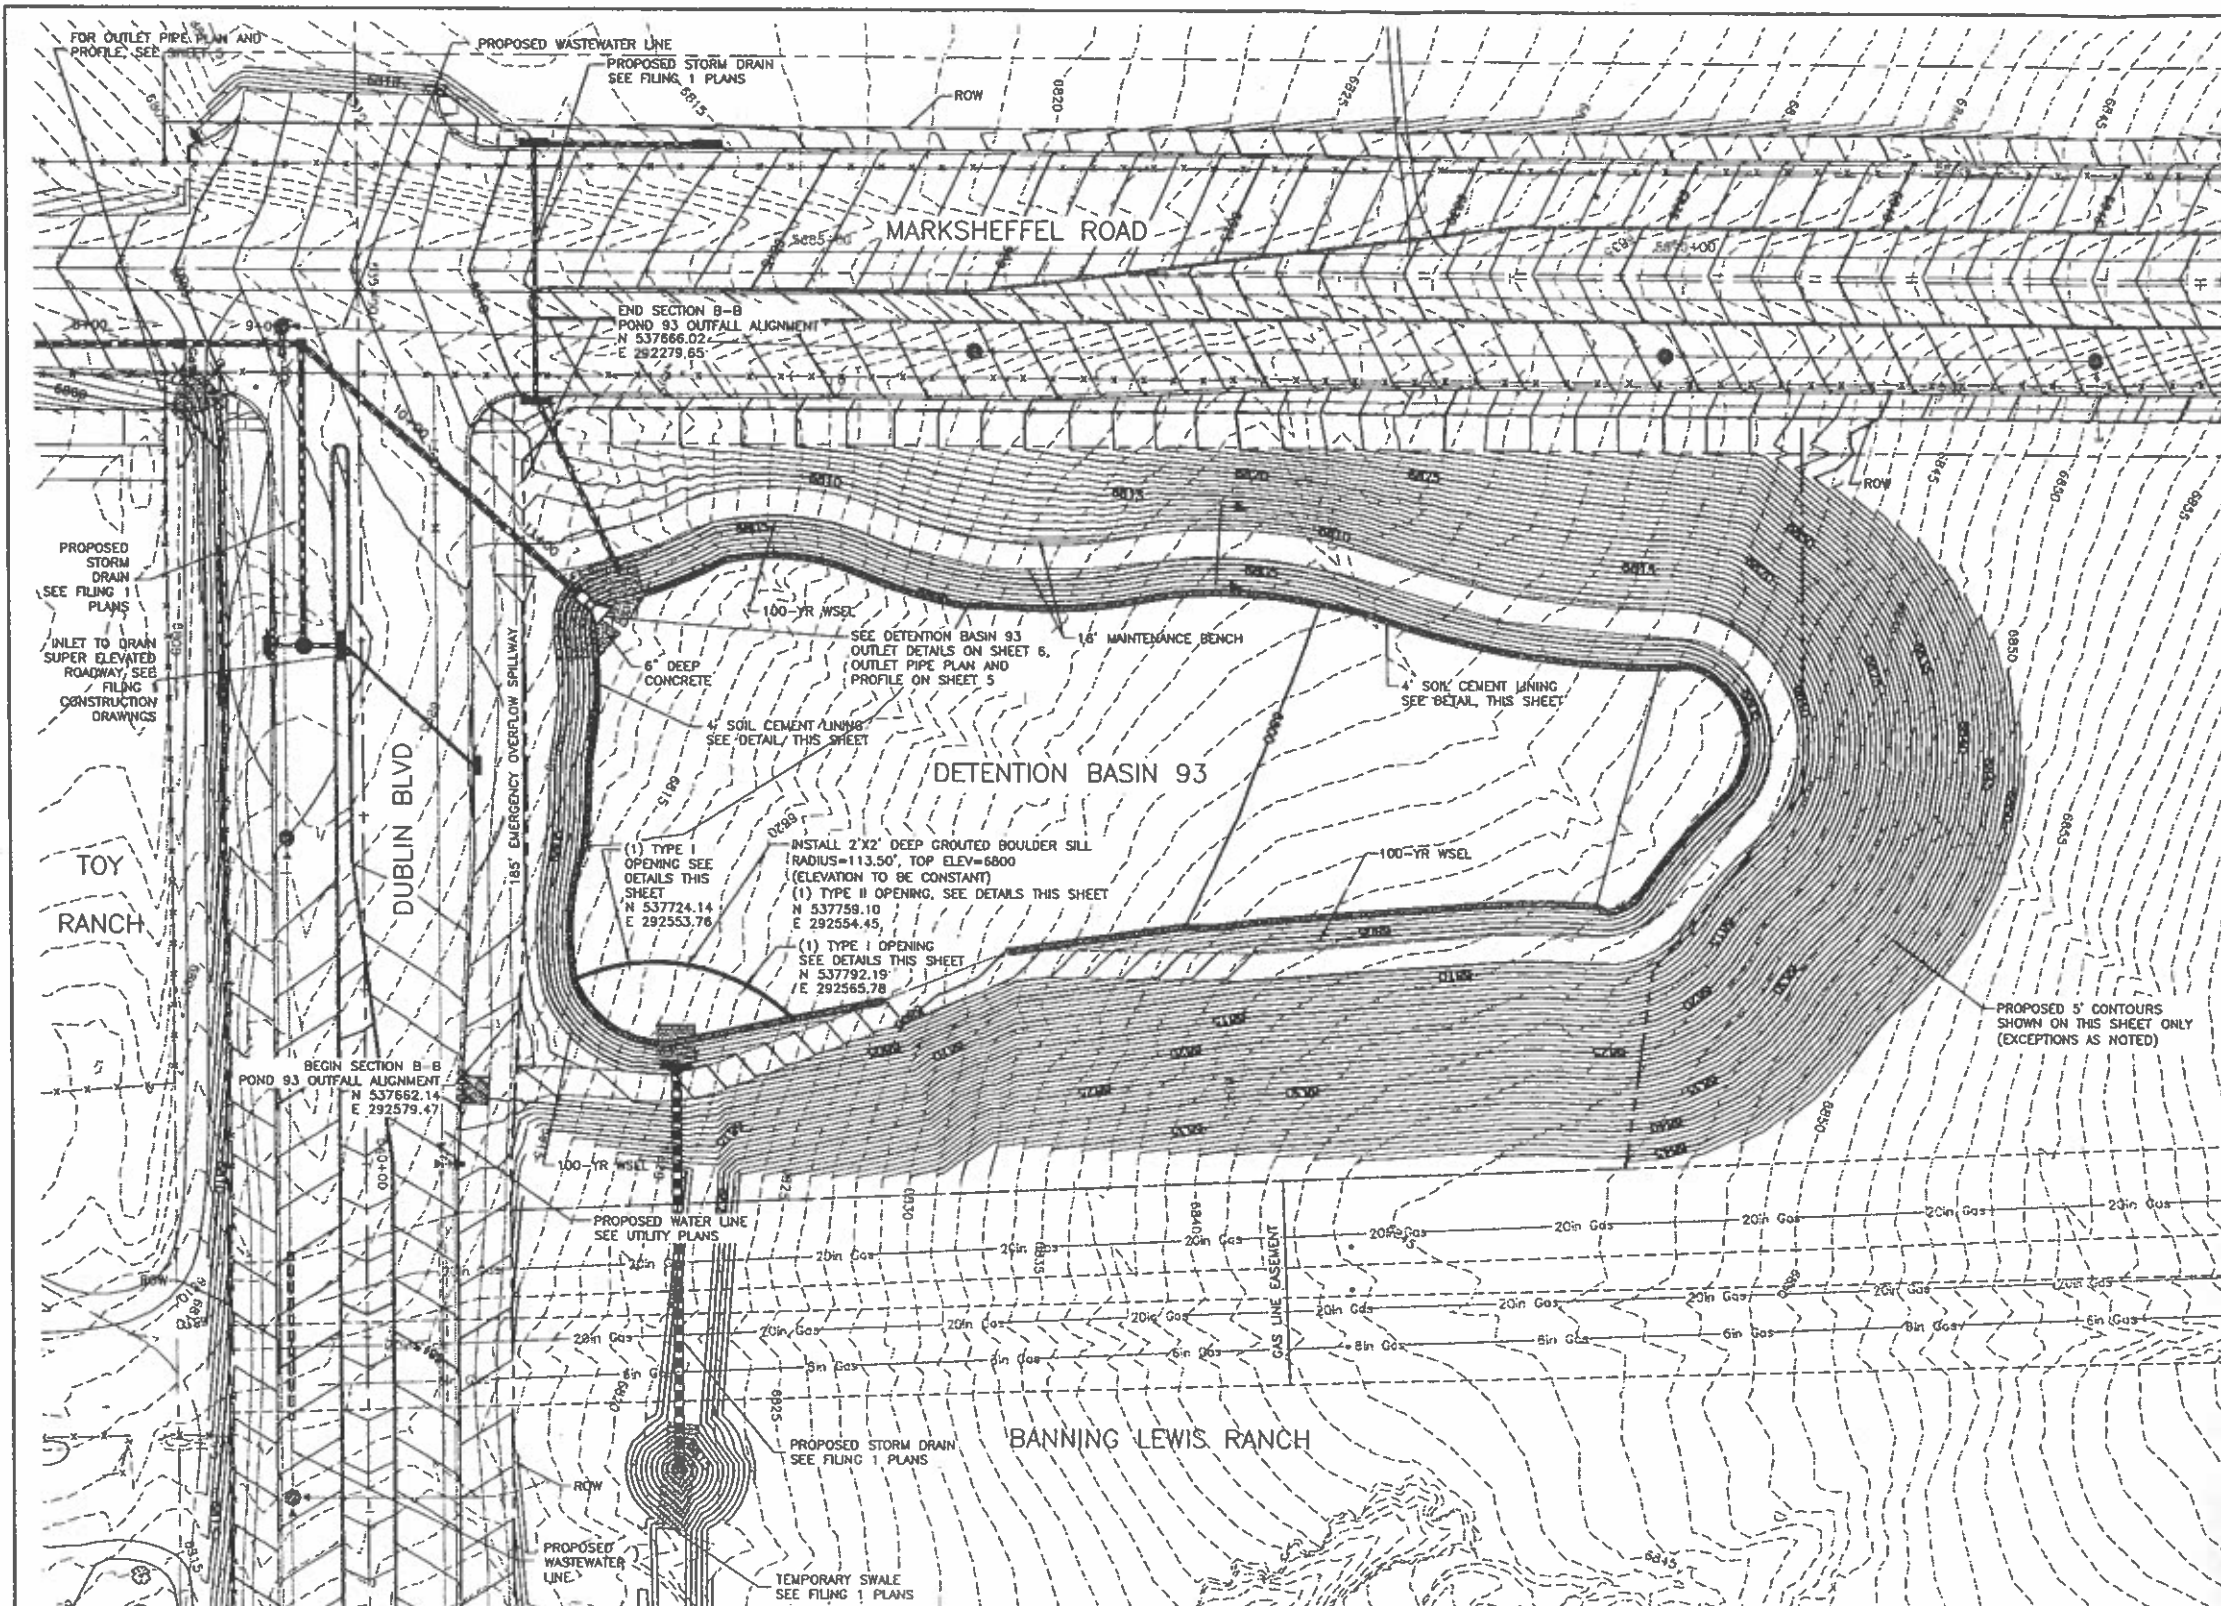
DETAILED DRAINAGE CONSTRUCTION PLANS AND SPECIFICATIONS
